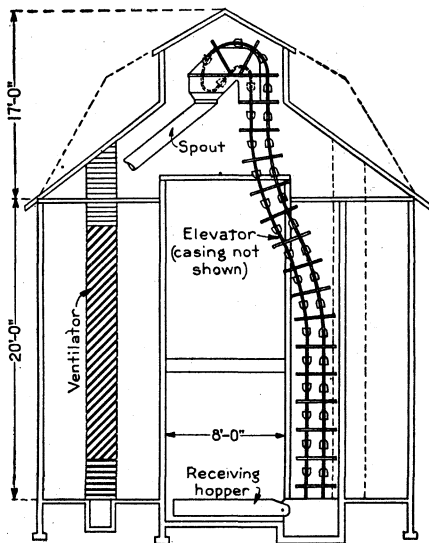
An arrangement of curved elevator leg common in circular masonry cribs. Two-pitch roof may replace cupola
